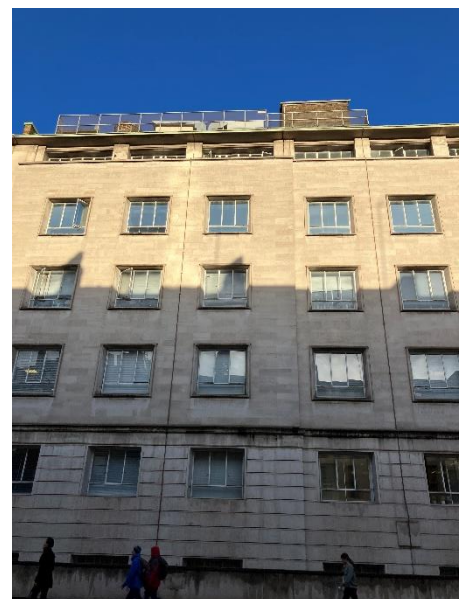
Survey Position 3 on Gower Street, looking upward towards plant area.
